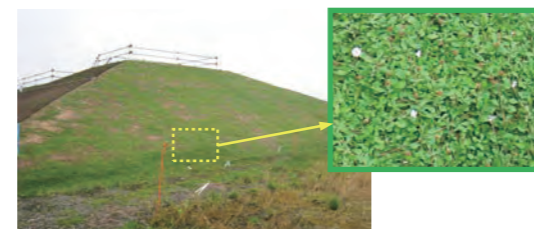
Slope planting: In this trial construction, clay discharged from screening process, was modified and then planting soil was made. All planting soil was recycled into planting construction works of the large-scale artificial ground that is created in Natori city, Miyagi Prefecture.
